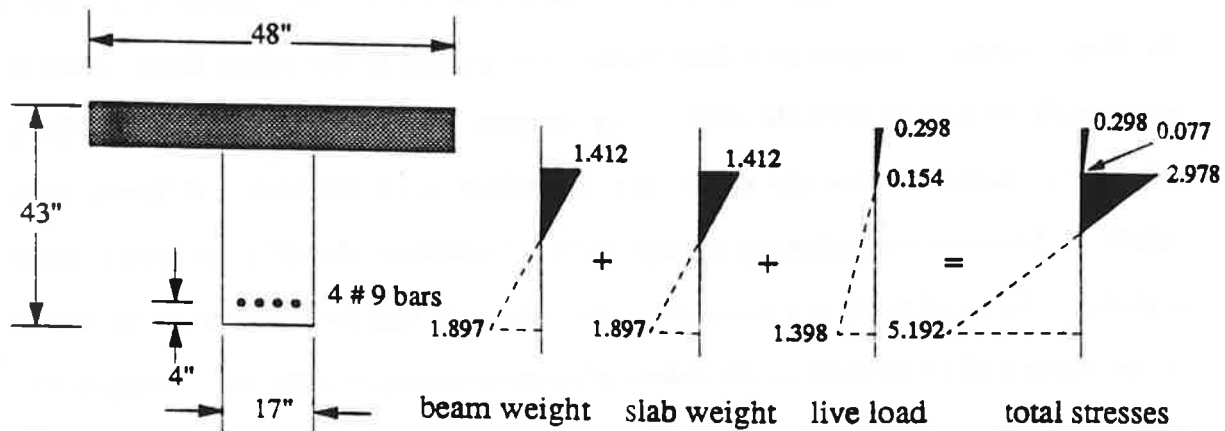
shows the beam geometry and the results of the calculations. It shows a rectangular precast reinforced concrete beam which is made composite by casting a concrete slab on its top. The horizontal shear stress of this example is calculated by the various methods discussed previously. The following comments can be made:
